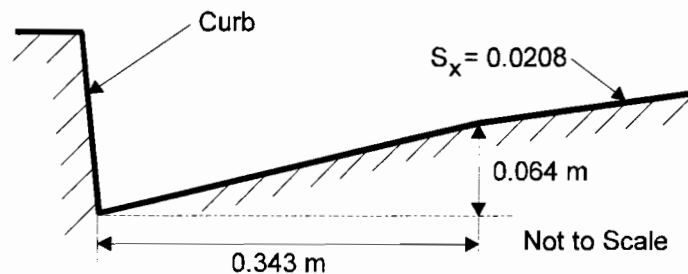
Cross-Section of Illinois Approach Gutter and Curb Inlet
